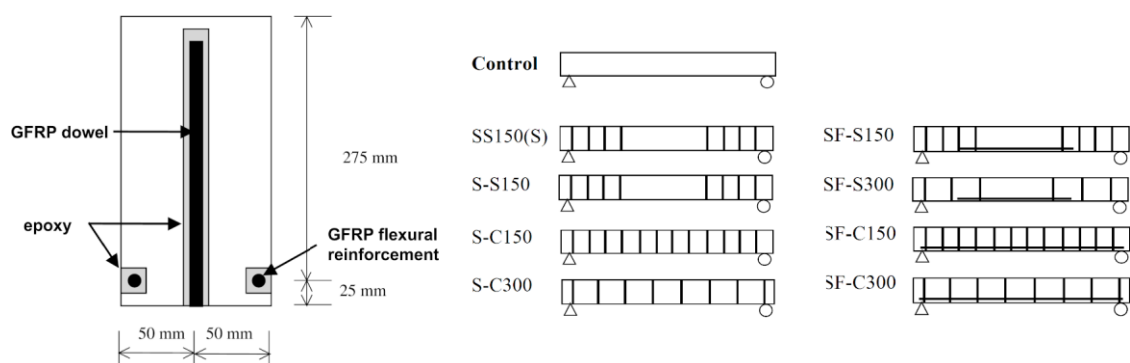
Reinforcement schemes studied by Svecova and Eden (2004).
